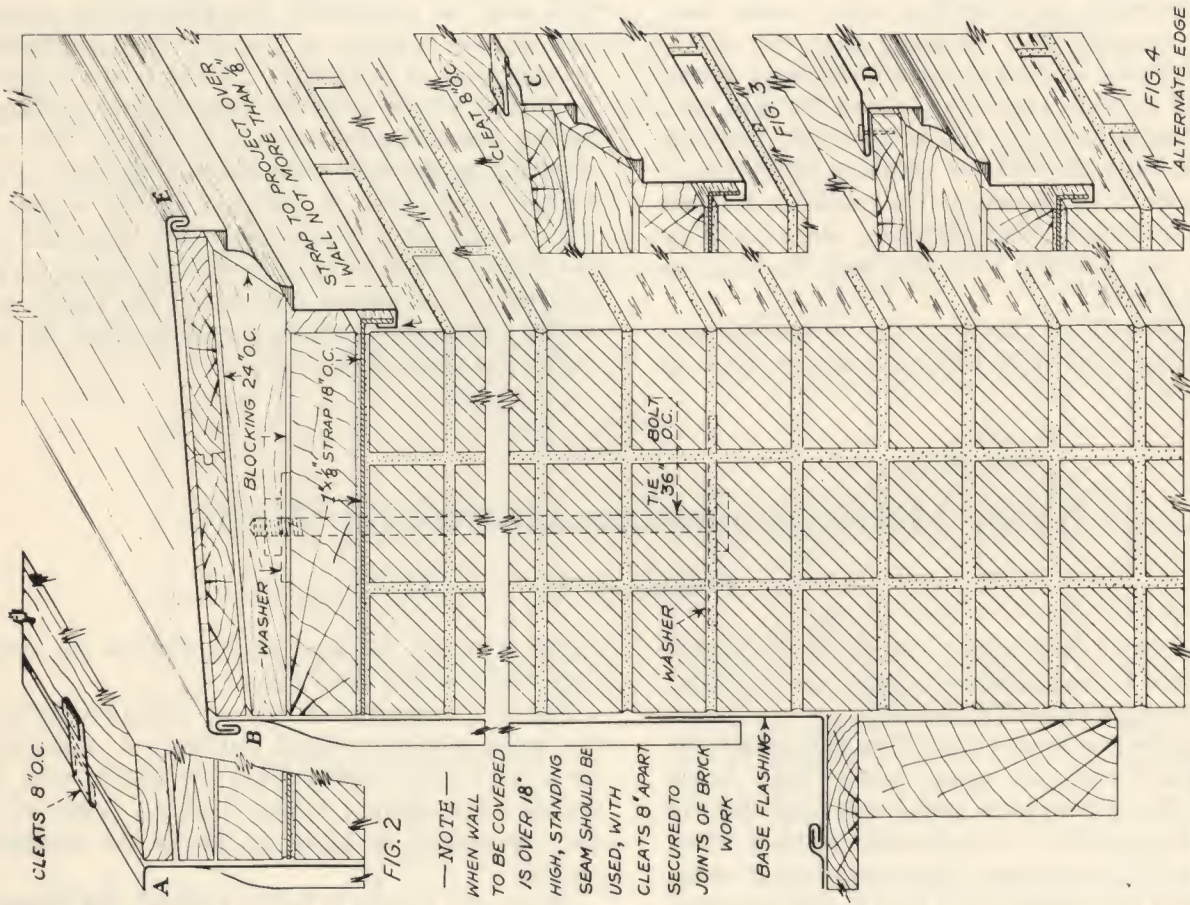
METHOD OF CONSTRUCTING MOLDED SHEET METAL COPING, LOCKED TO
